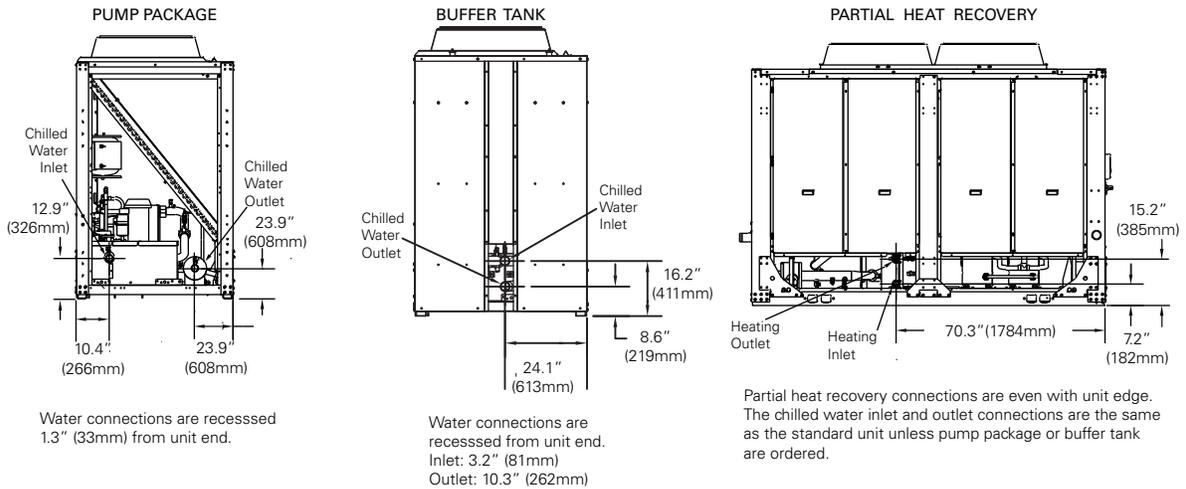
CGAM 130 ton — pump package, buffer tank, partial heat recovery
